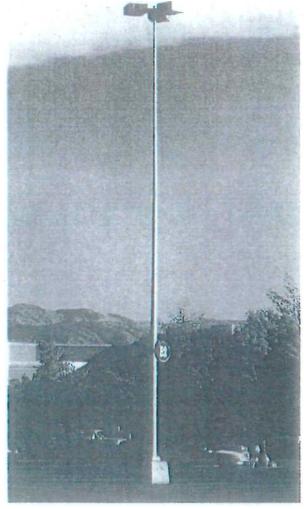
EXAMPLE OF PROJECT PARKING LOT LIGHTING
